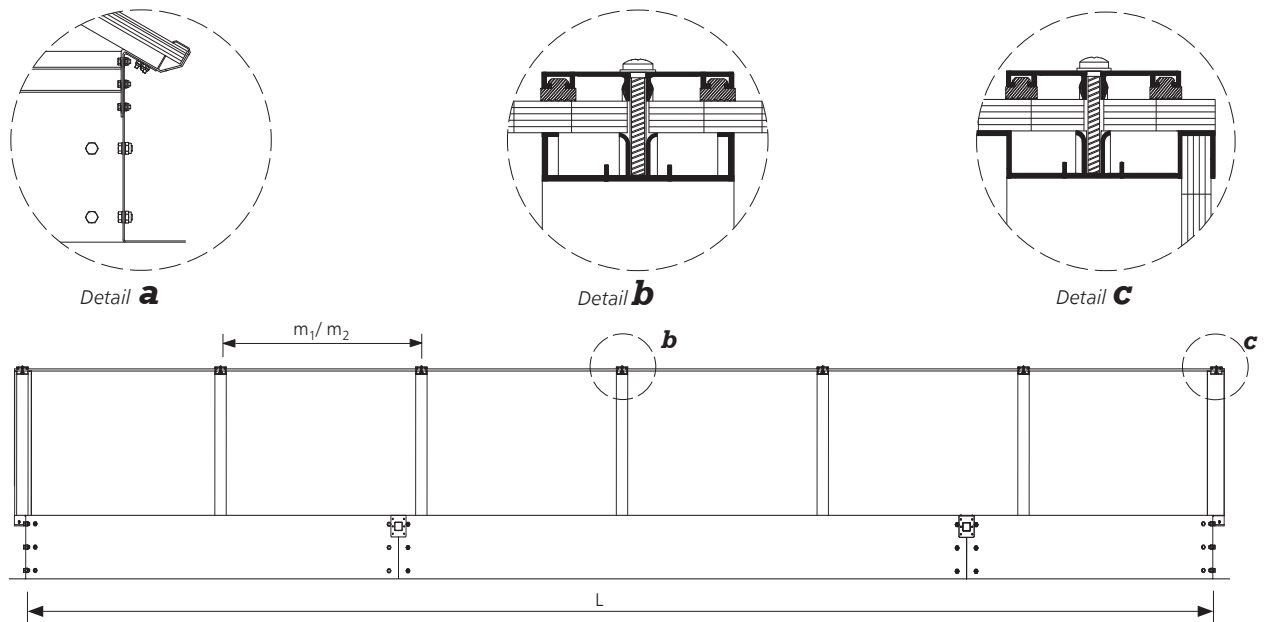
Cross section B-B of mcr PROLIGHT triangular shaped continuous rooflight
